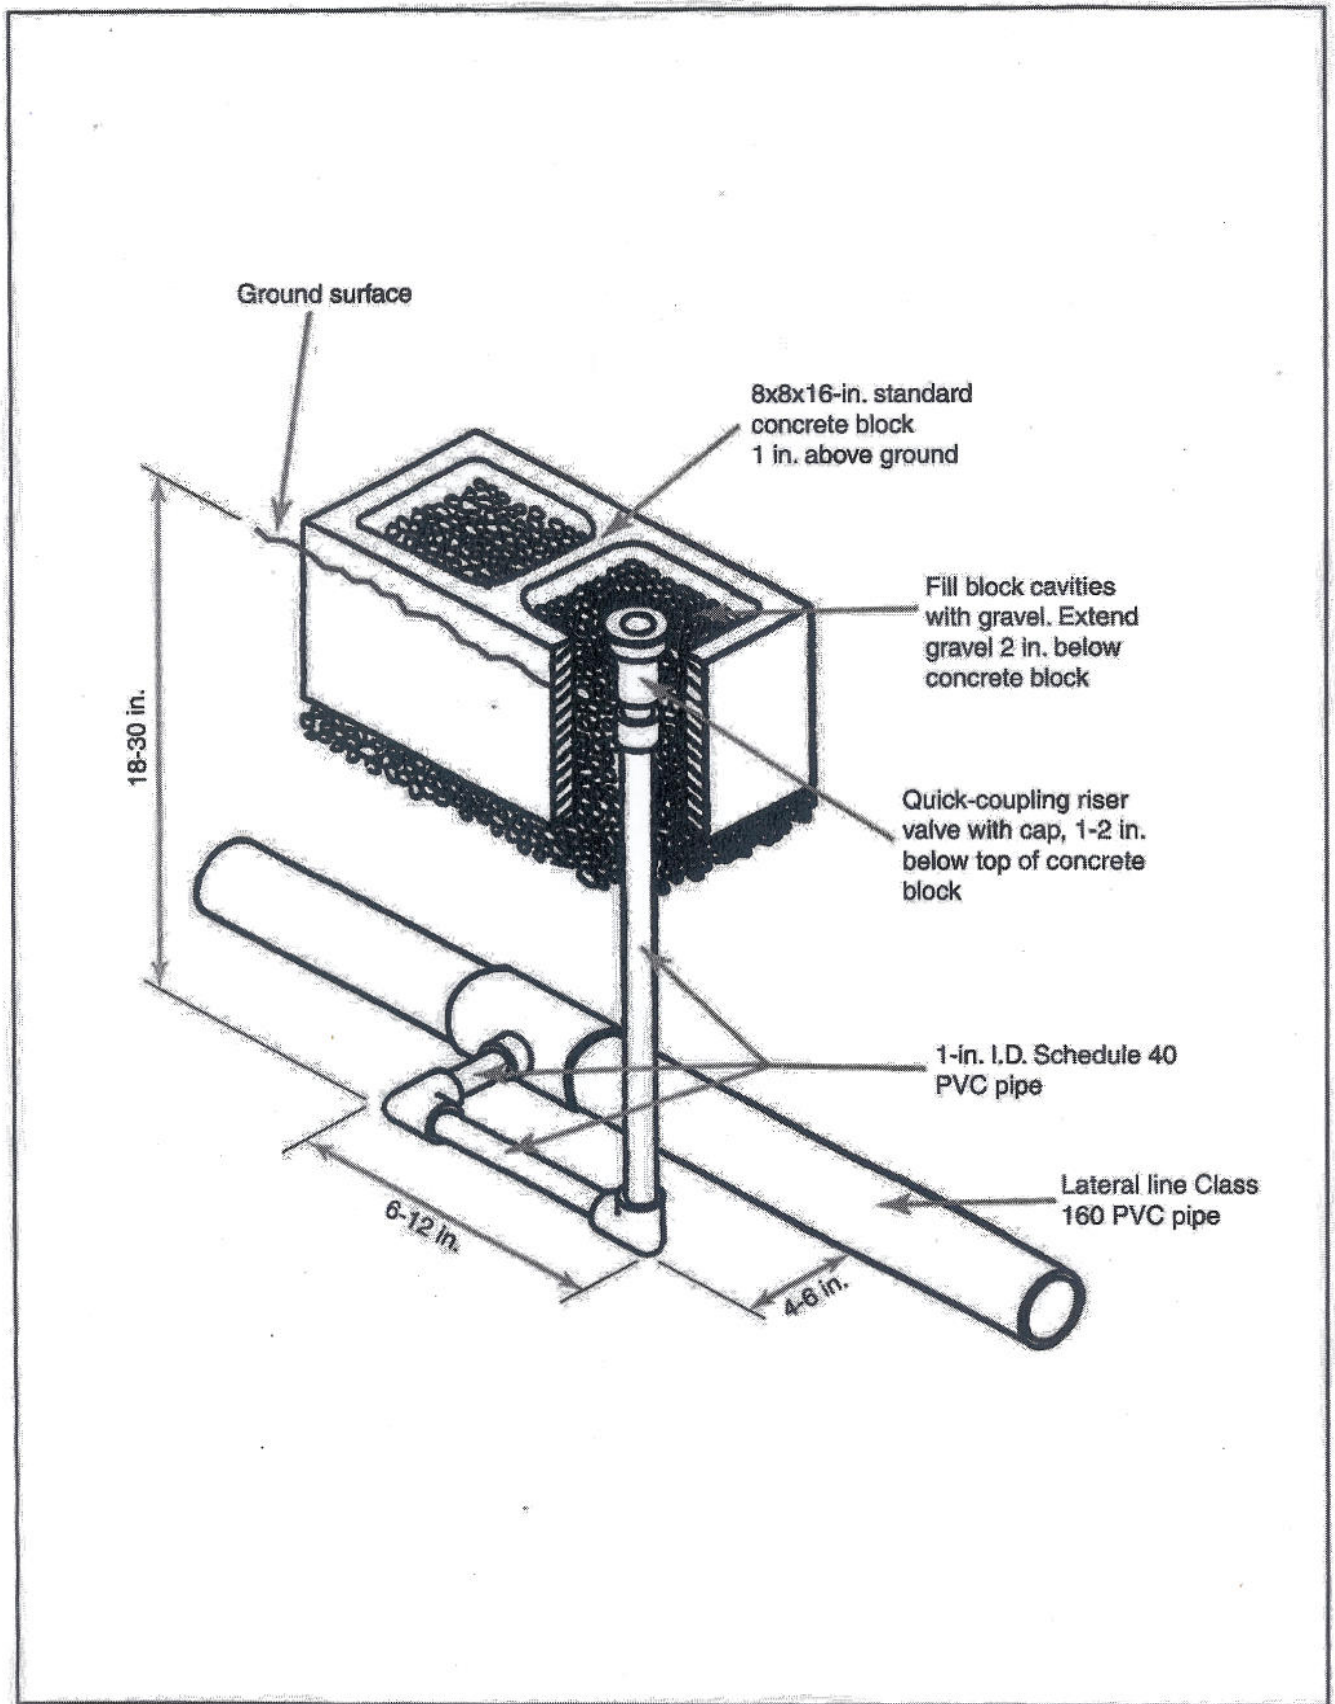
Swing Joint for Quick-Coupling Riser Valve.
